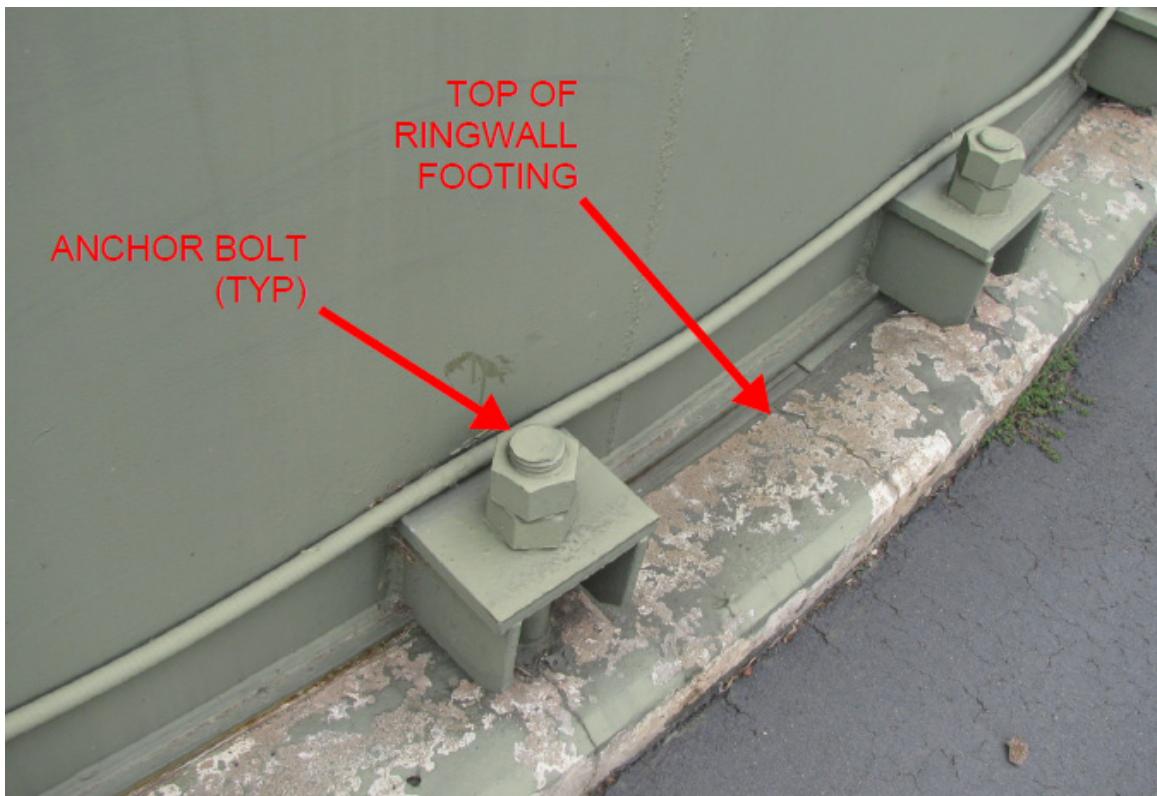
The Backwash Water Tank is anchored to the concrete ringwall footing with (54) 2-inch diameter galvanized steel anchor bolts.
